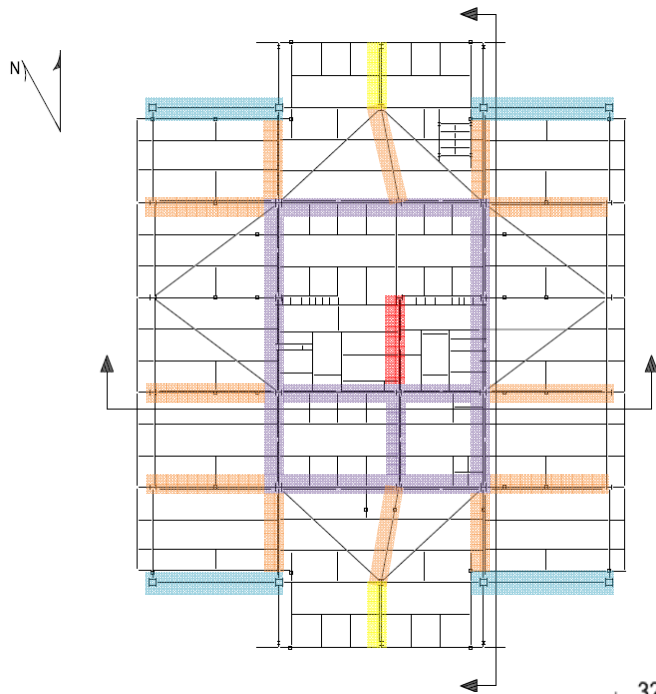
Mechanical Floor Framing Plan (Floors 28 & 51)
